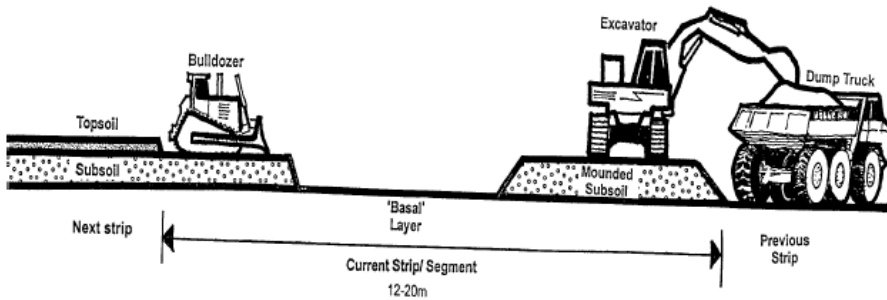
Soil stripping with bulldozers and dump trucks: Subsoil
